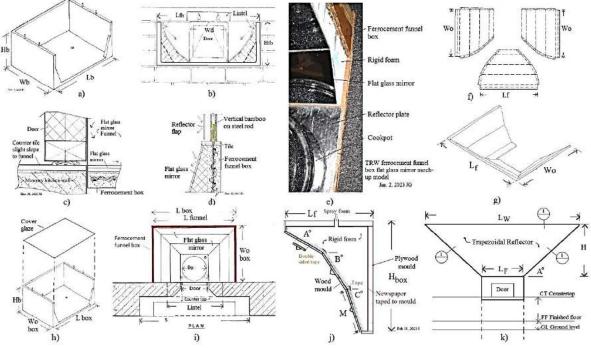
TRW Prefabricated Ferrocement Funnel-Box with Flat Glass Mirrors or Aluminum Reflectors Studies: a) isometric with open side; b) EW section viewing cookware door; c) detail section at cookware door and countertop; d) section at E and W rim with extended rods for portable reflector; e) photo of flat glass mirrors glued to rigid foam; f) CPC-type aluminum funnel parts; g) 3-sided CPC funnel isometric; h) glazed cover above ferrocement box; i) plan of kitchen wall at cookware door and funnel; j) CPC funnel mold for rigid foam; k) elevation of cookware door and kitchen wall trapezoidal reflector.
